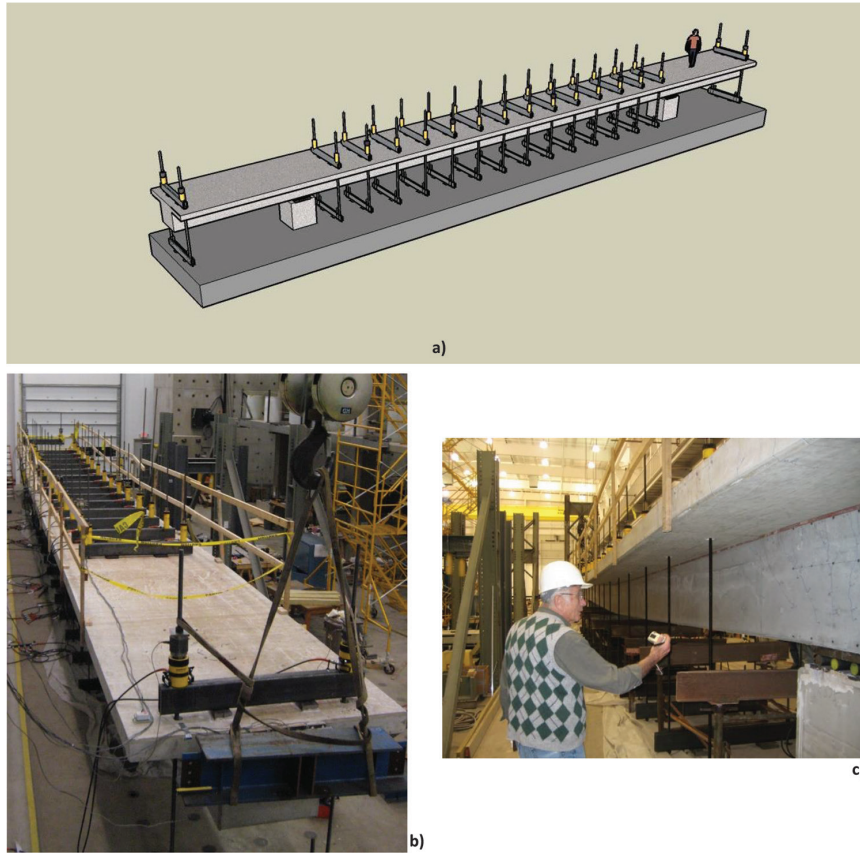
(a) Test specimen, three-dimensional view; (b) test specimen view from above; and (c) side view of test specimen during loading and late Prof. Mete Sozen examining crack pattern.
